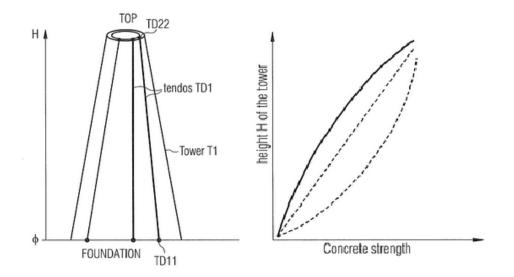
Required concrete strength over the tower height for a wind turbine tower according to Stiesdal (2012)
